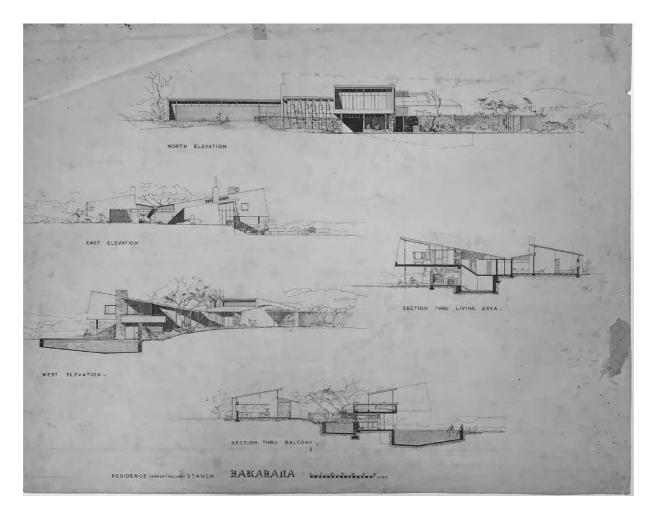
House *Hakahana*, Residence of Carmen and Hellmut Stauch, Hartbeespoort Dam, district of Brits 1952, Architect Hellmut Stauch. North, east, and west elevations including section through living area and section through balcony. Courtesy of the Architecture Archives Pretoria University.
